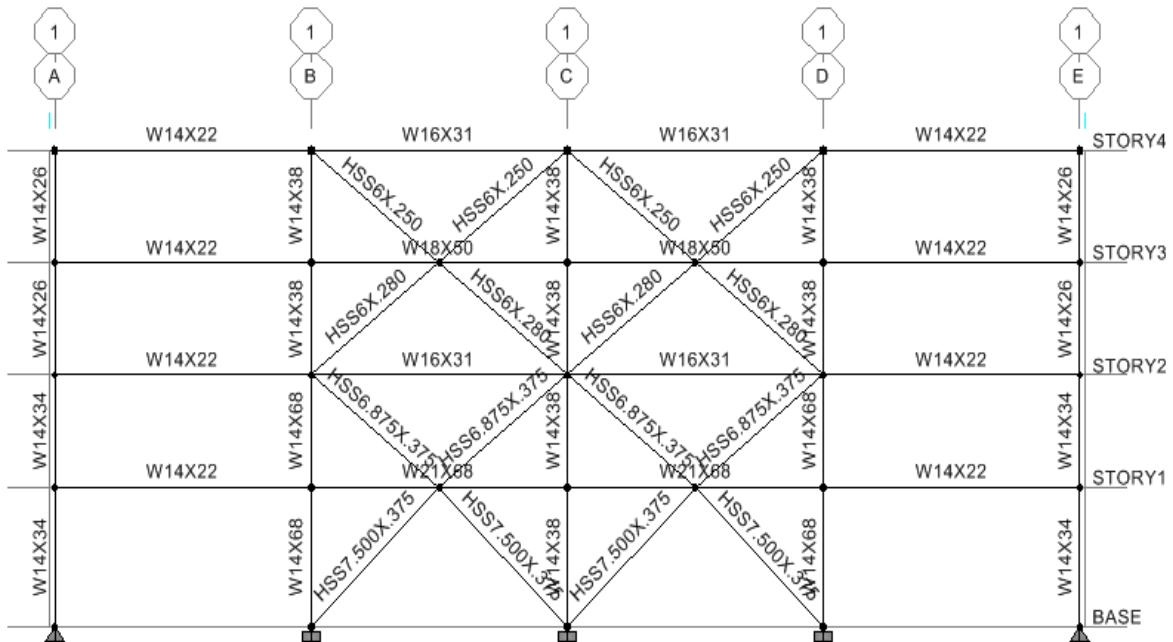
Elevation of Typical AISC 2005 Braced Frame
